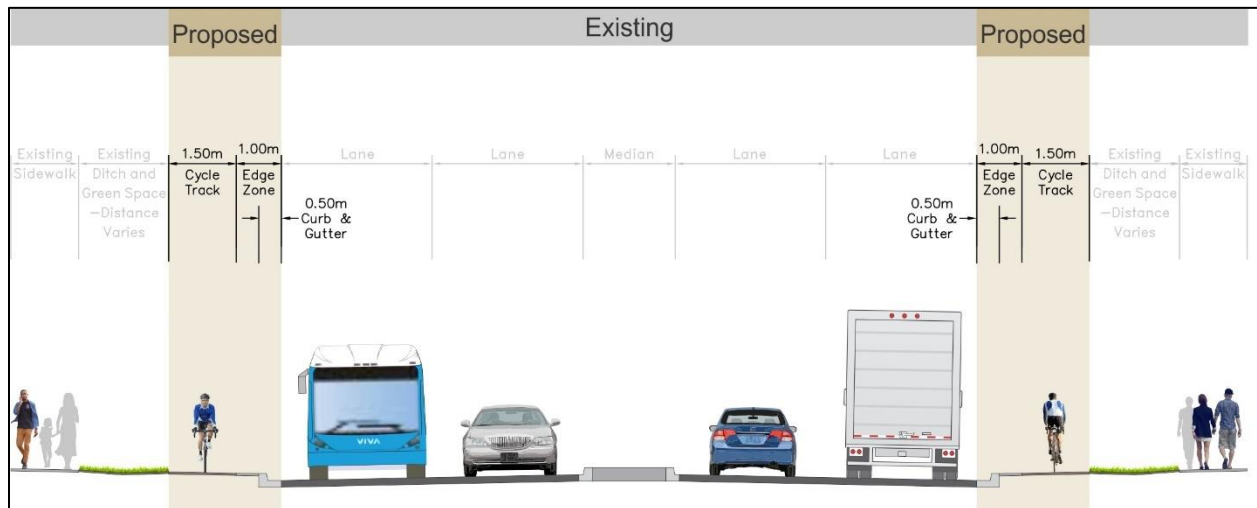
Langstaff Road Overpass Bridge Typical Cross-Section
